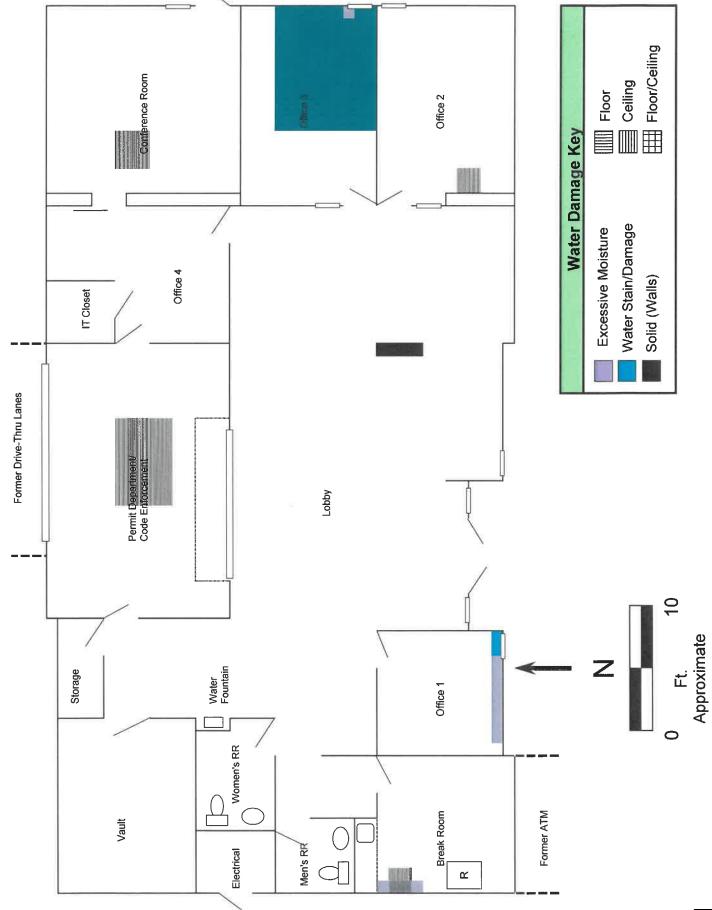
Floor Plan - Water Damage Locations (24009-0340 Former Bank Building - Dundee)
